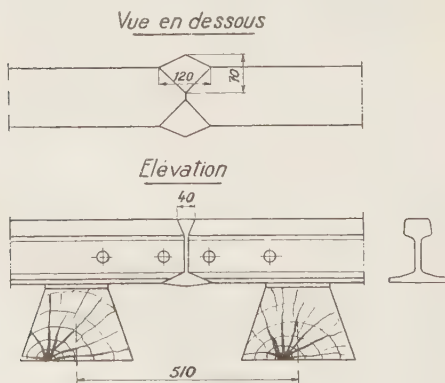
« Böhrer » type welded joint (*Jugoslav State.*)
